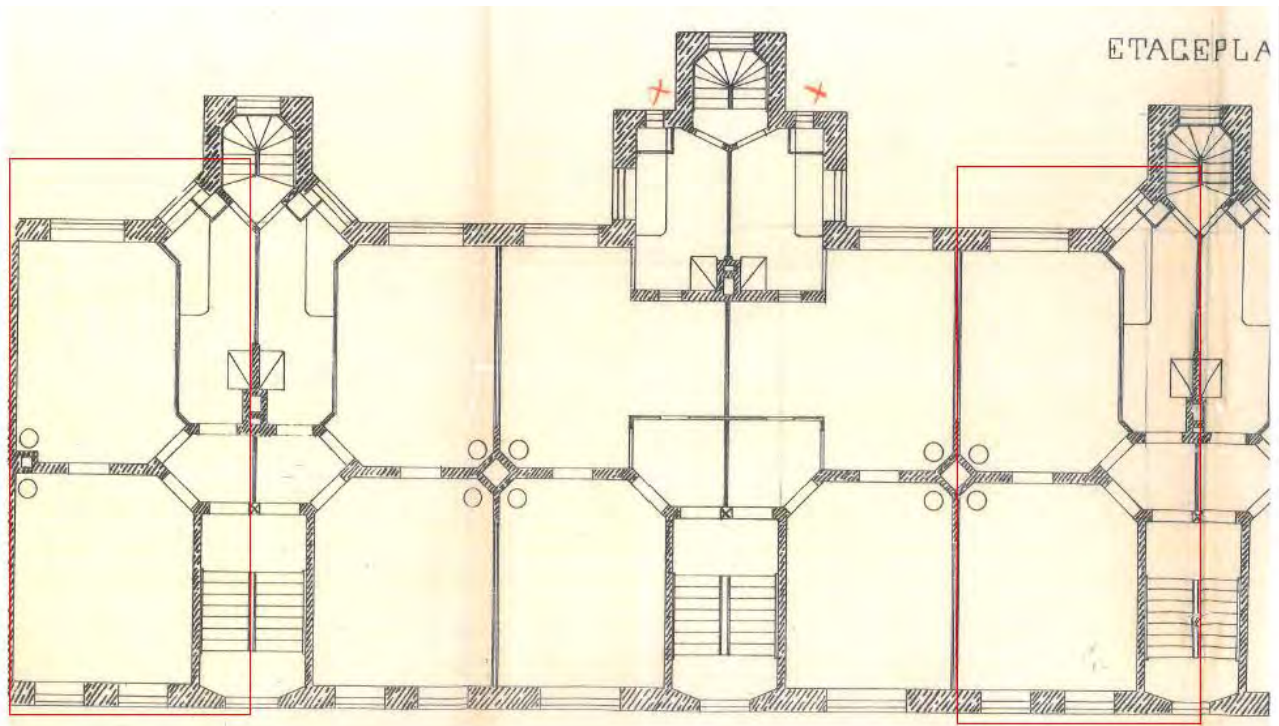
Floor-plan of Thomas Laubs Gade 5 used in the case calculation (red marking plus apartment placed symmetrical around the stair-well)
